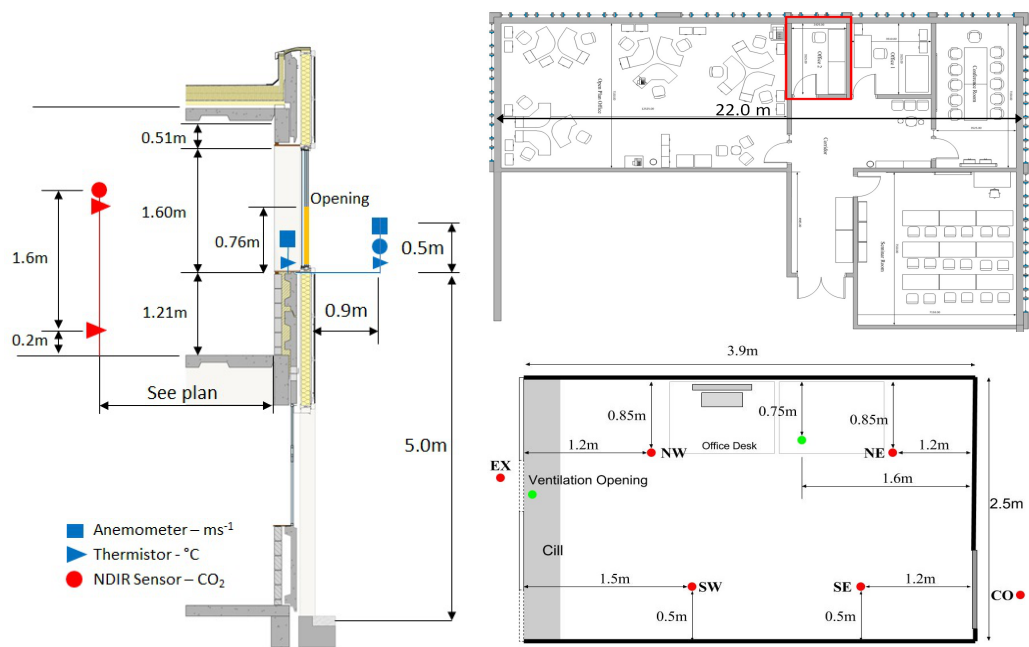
Experiment setup details. Left: Building section showing heights and depths of instrument positions. Right top: Overall testbed first floor plan with test room marked in red. Right bottom: Dimensions of CO_2 and Temperature measuring locations
